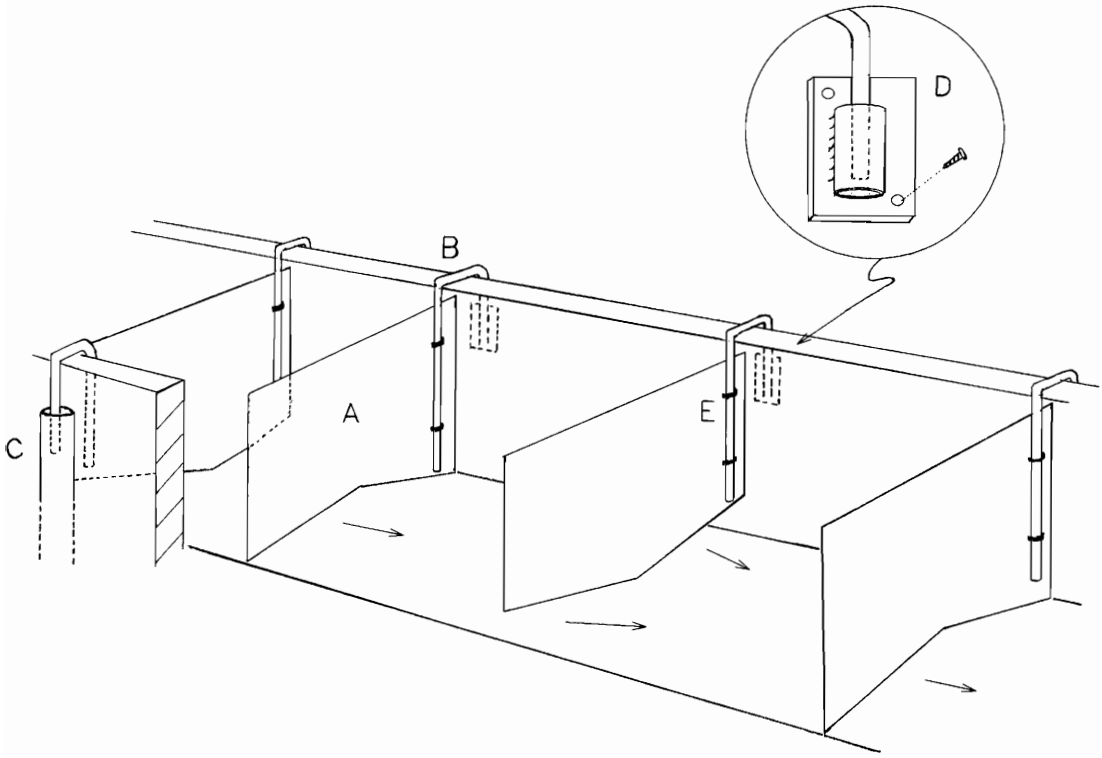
Diagram of baffle configuration and components: (A) 2-mm aluminum baffle; (B) 13-mm reinforcement bar; (C) steel pipe driven into the ground; (D) steel pipe welded to metal plate and bolted to concrete wall; (E) U-bolt or wire. C and D show alternative ways to anchor the baffle in place. Note alternating profile of lower baffle margins and arrows indicating water flow pattern.
